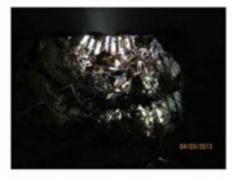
branch "A" station 18+53 (R7): beehive inlet
